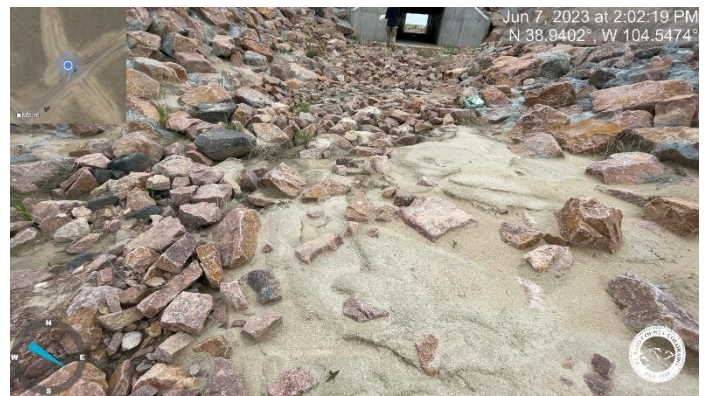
Box Culvert Inlet: Riprap is not uniform Type H. Remove sediment and implement approved Type H riprap. Grouted riprap slopes should be shown on the as-builts. Reference Sheet 36 of the Construction Drawings.
